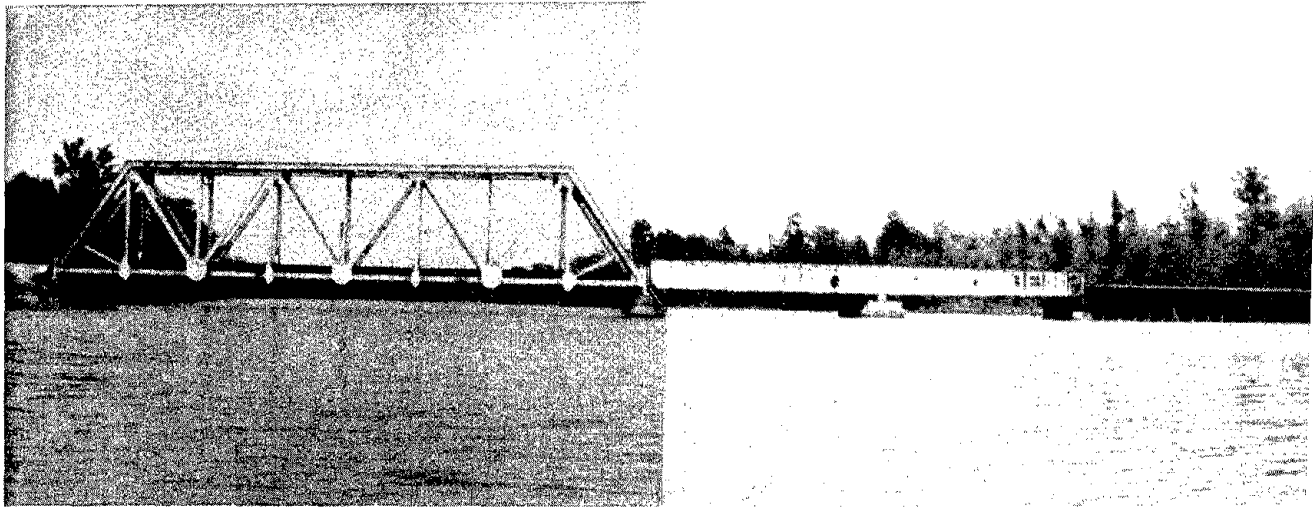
Last inspection photograph of Big Bayou Canot railroad bridge before accident.
